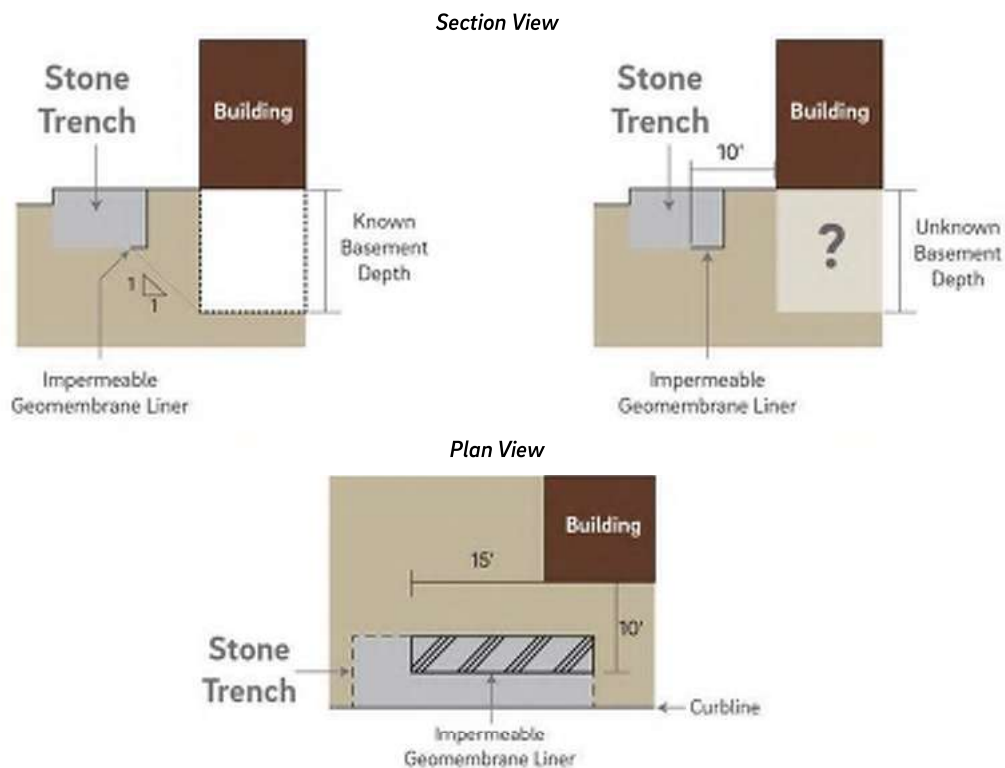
Extent of impermeable geomembrane liner for trenches near buildings.
